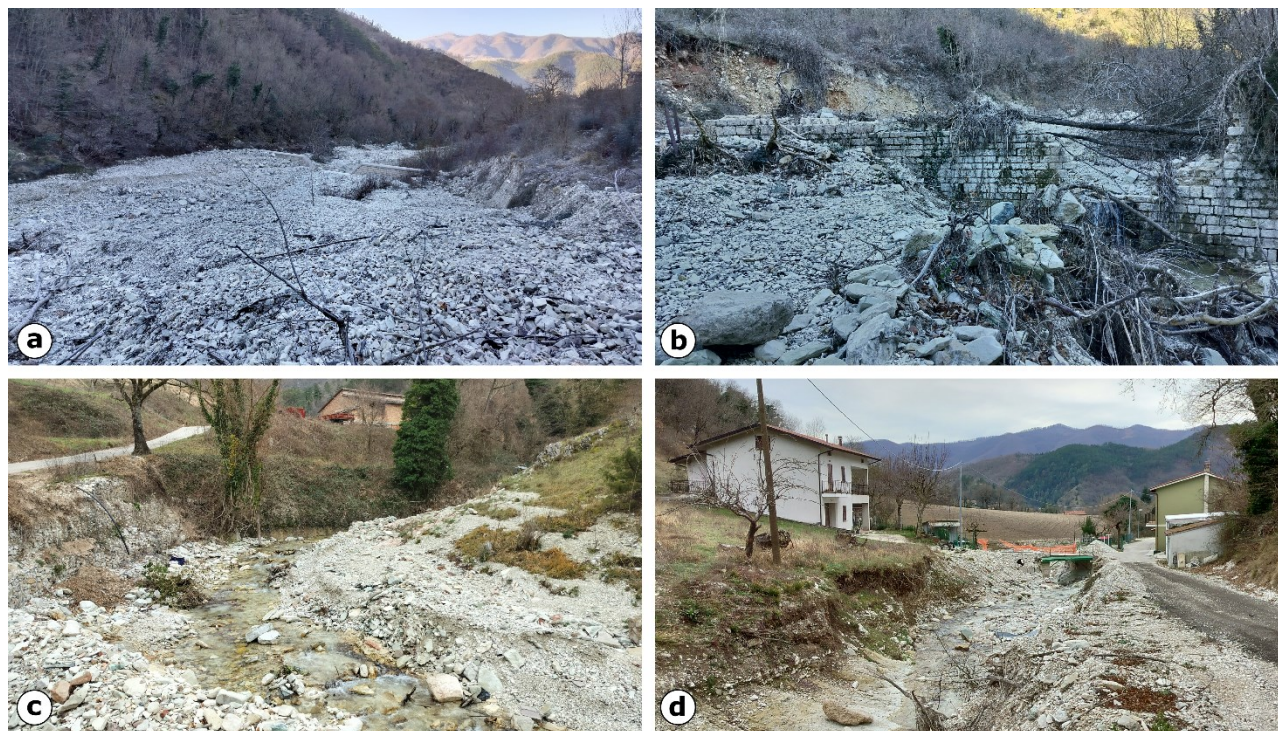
Critical issues represented by the anthropic structures: a) filled and buried hydraulic weir seen from upstream; b) damaged hydraulic weir; c) damaged gabion wall; d) undersized bridge in the hamlet of Tenetra.
